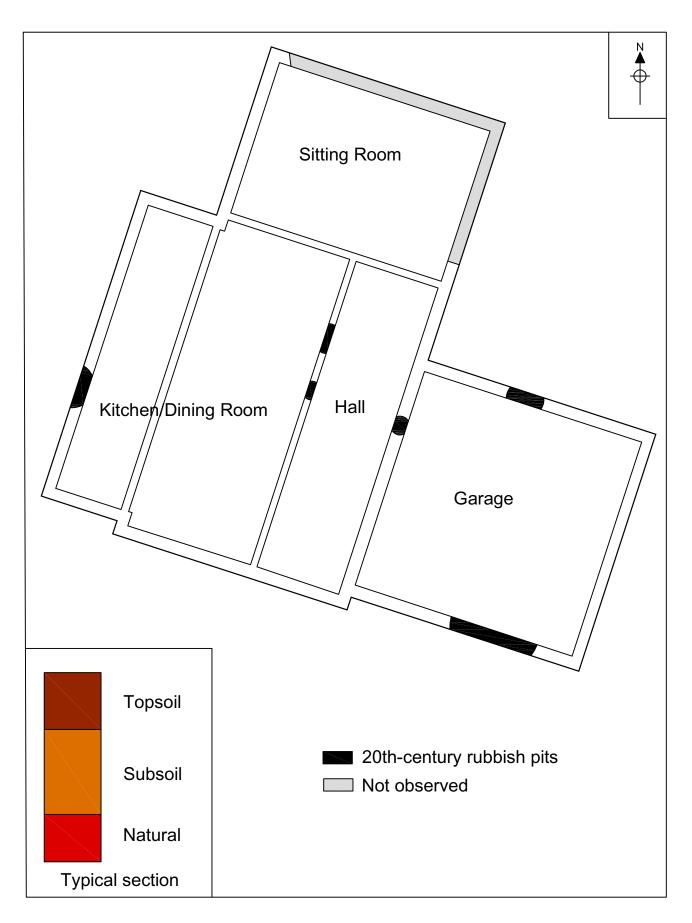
Showing plan of footings (Scale 1:100) and typical section (Scale 1:20).
